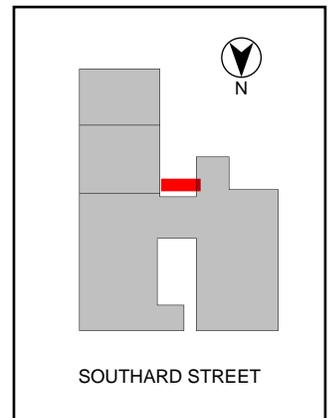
CONNECTING HYPHEN, REAR ELEVATION
